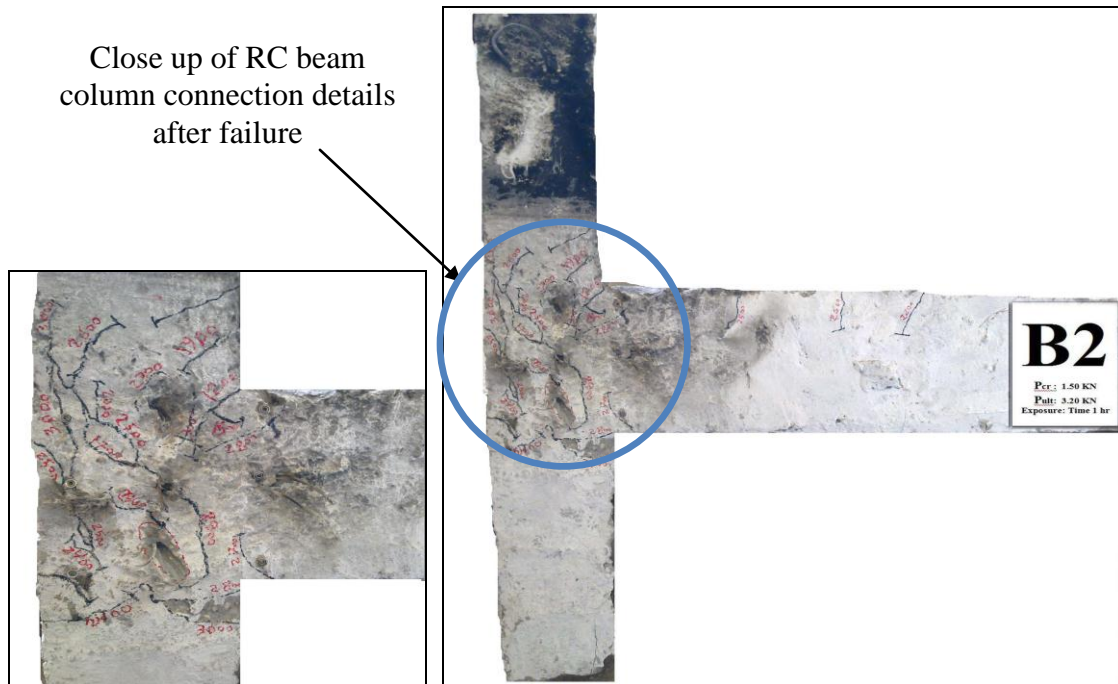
Crack Pattern of Specimen B2 at 600°C for 1hr
